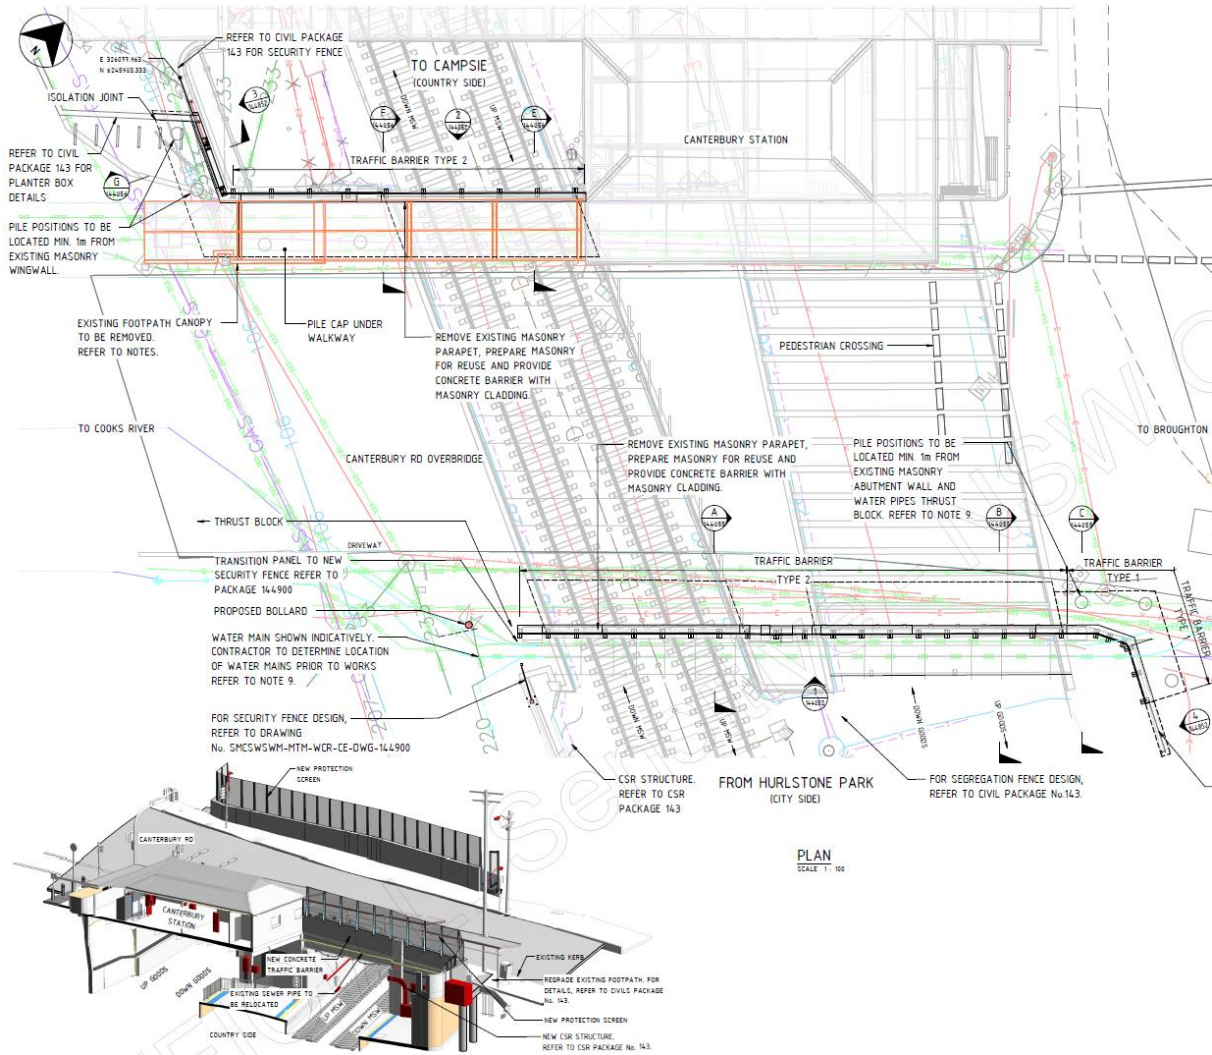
Plans of treatment works for Canterbury Road Bridge (Source: Metron T2M 2022, provided by ARCH Artifex)
